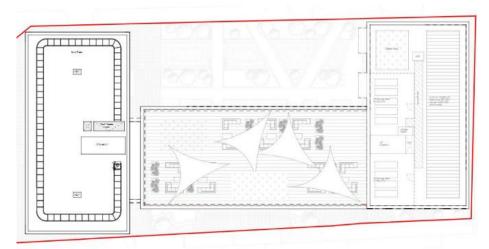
Plot 1 – Roof Floor Plan (Source: 20039-GNA-P1-23-DR-A-1106 Rev B)
